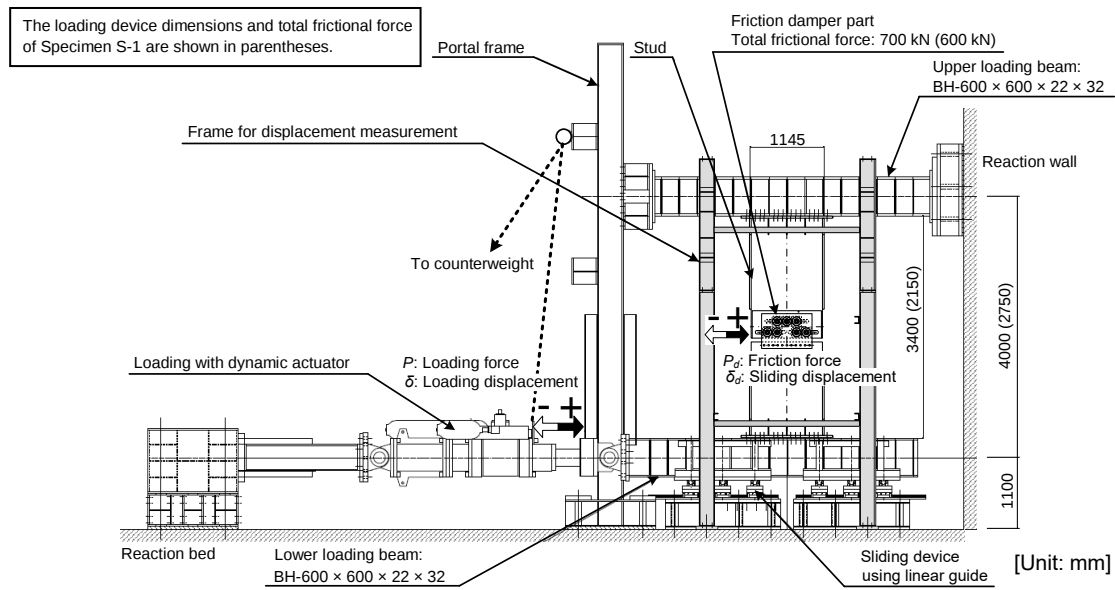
Elevation drawing of the loading system in full-scale tests for Specimen S-2 (S-1)¹⁾
